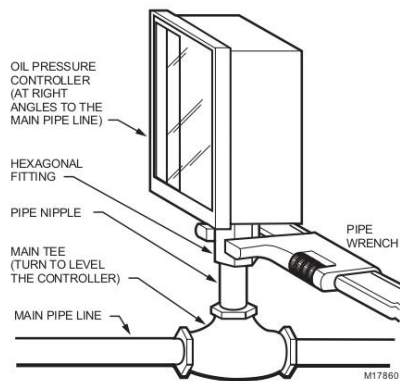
Mounting an oil pressure controller directly on the main pipe.
